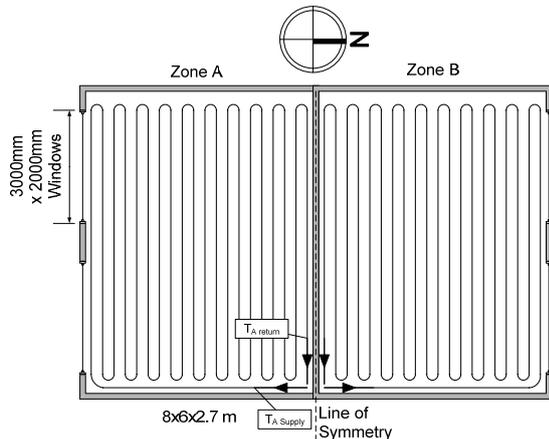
Principal outline of the considered building. Pipe loops are illustrated in each zone
